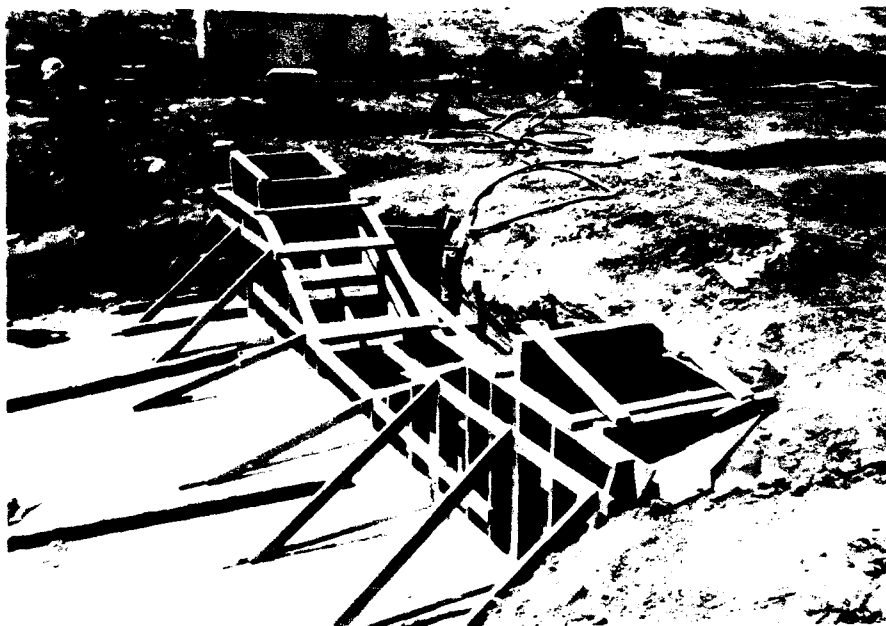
Forming for collar structural concrete after build up of backfill concrete beneath collar forming. Downstream is to right.
